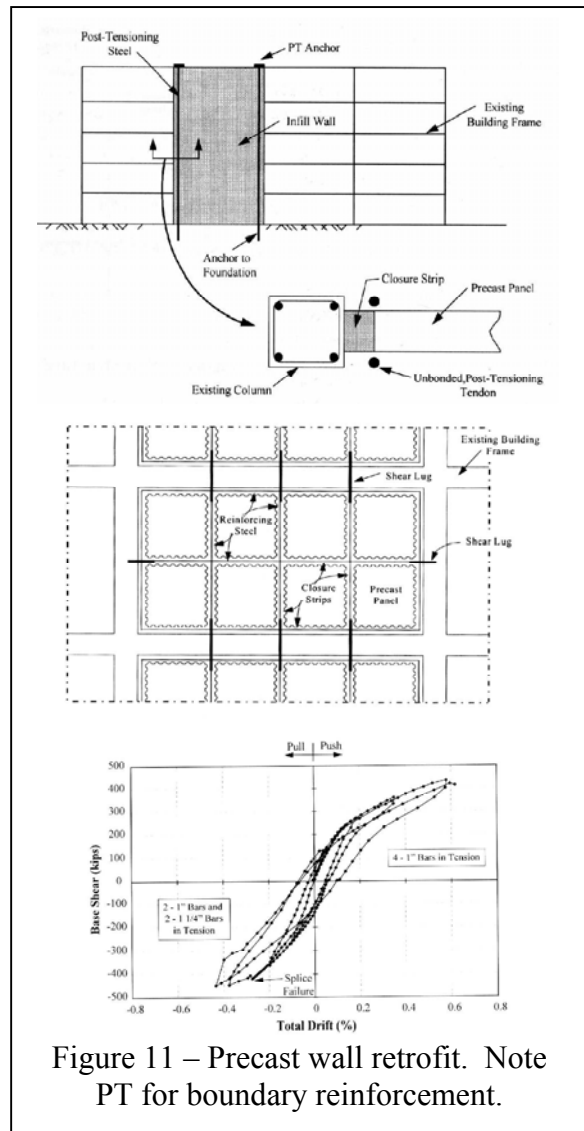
Precast wall retrofit. Note PT for boundary reinforcement.
